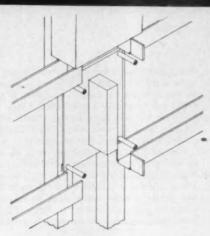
Open wiring channels make tracing and wire replacement easy.
